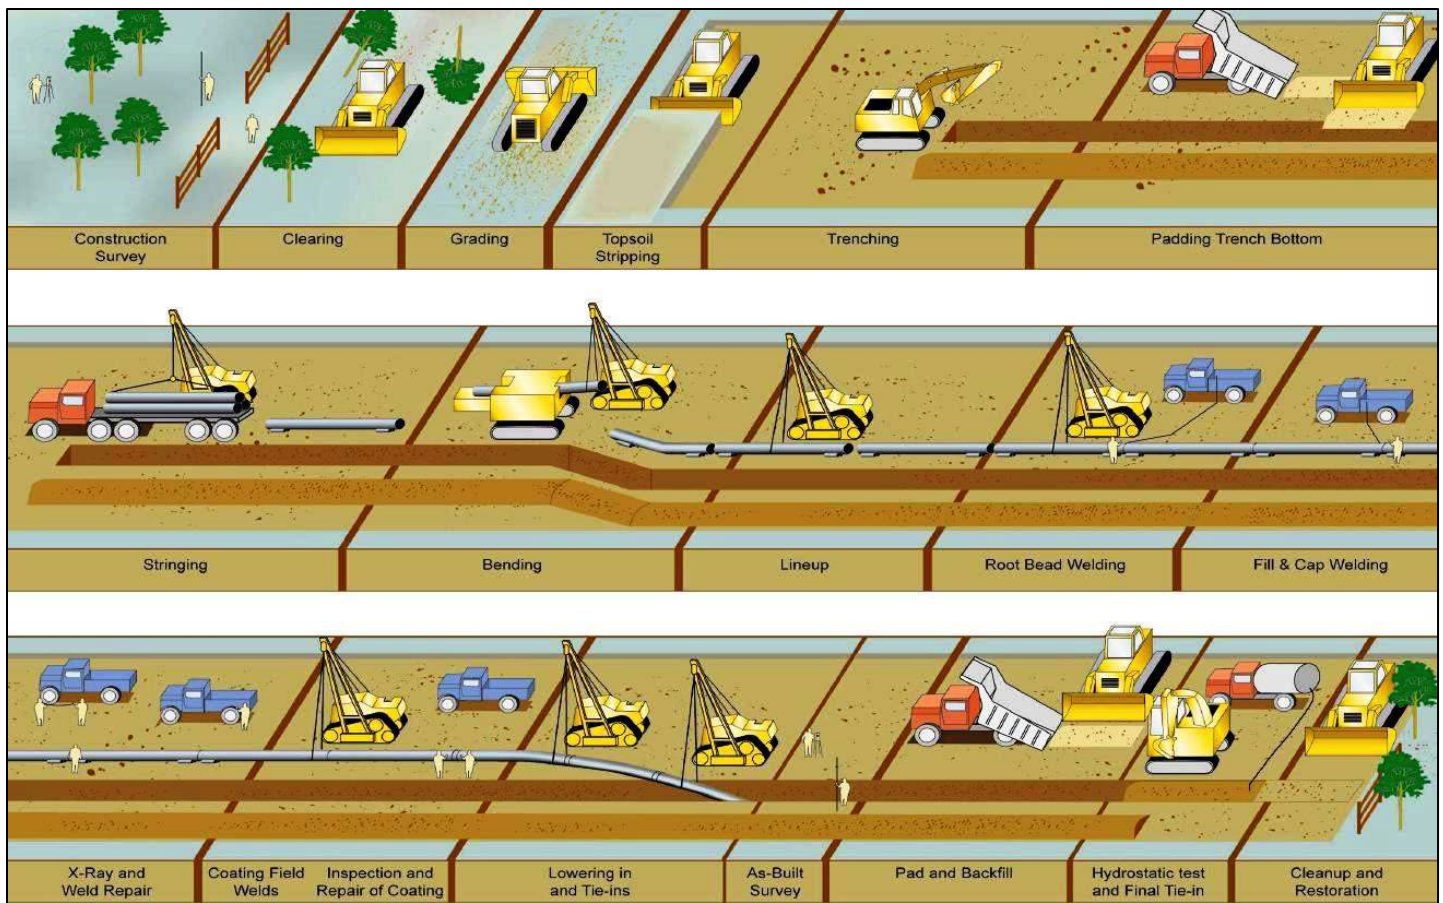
Progression of typical construction practices to install a natural gas pipeline, beginning with construction survey (upper left) and finishing with cleanup and restoration (lower right).
